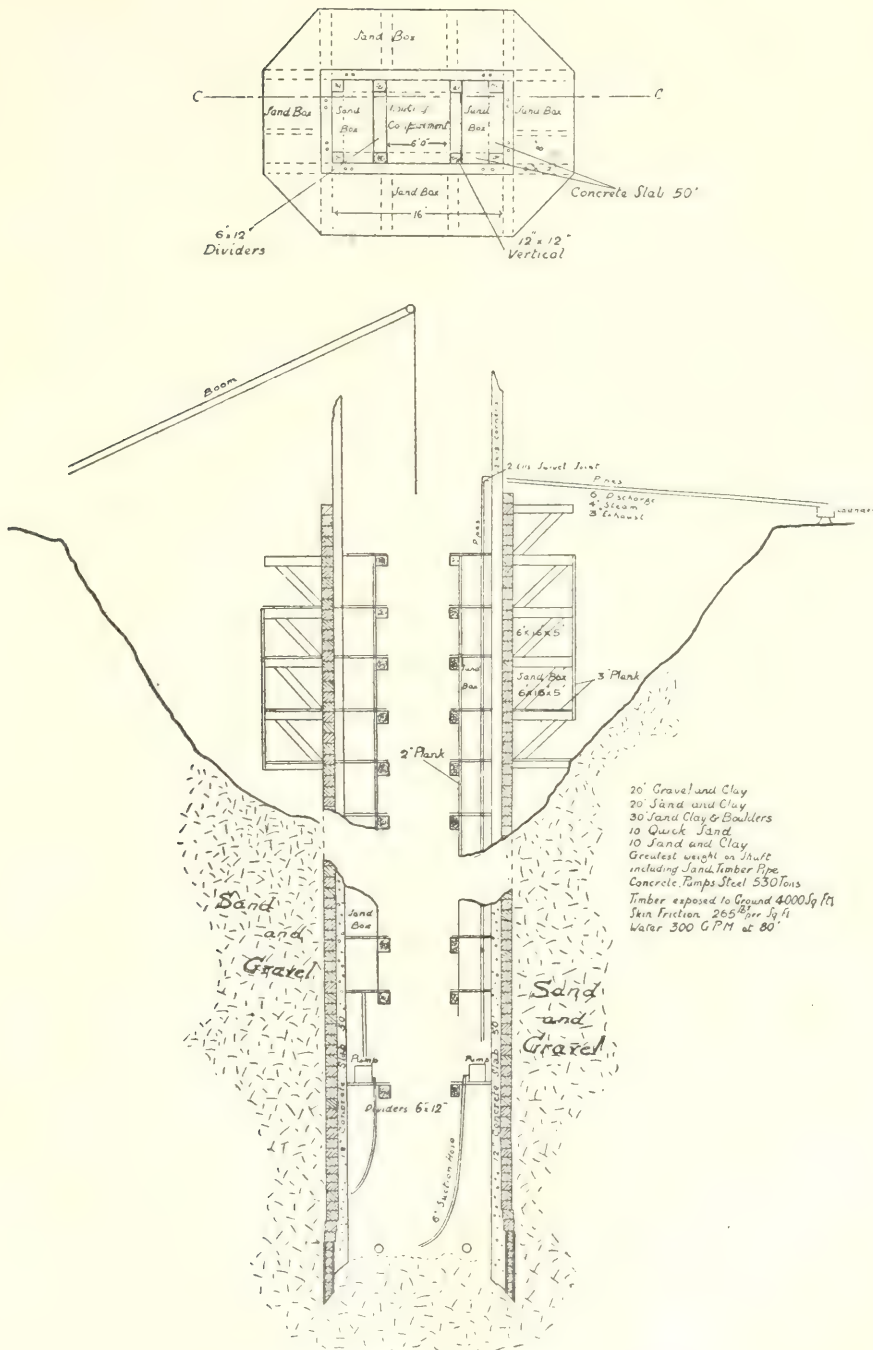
VERTICAL SECTION SHOWING METHOD OF SINKING.
